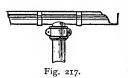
shows a nozzle outlet of an eaves gutter, the nozzle fitting into and being jointed to an ordinary rainwater pipe. In the case of a parapet or similar gutter, a short pipe or tube is led through the wall to discharge over a more or less ornamental rain-
